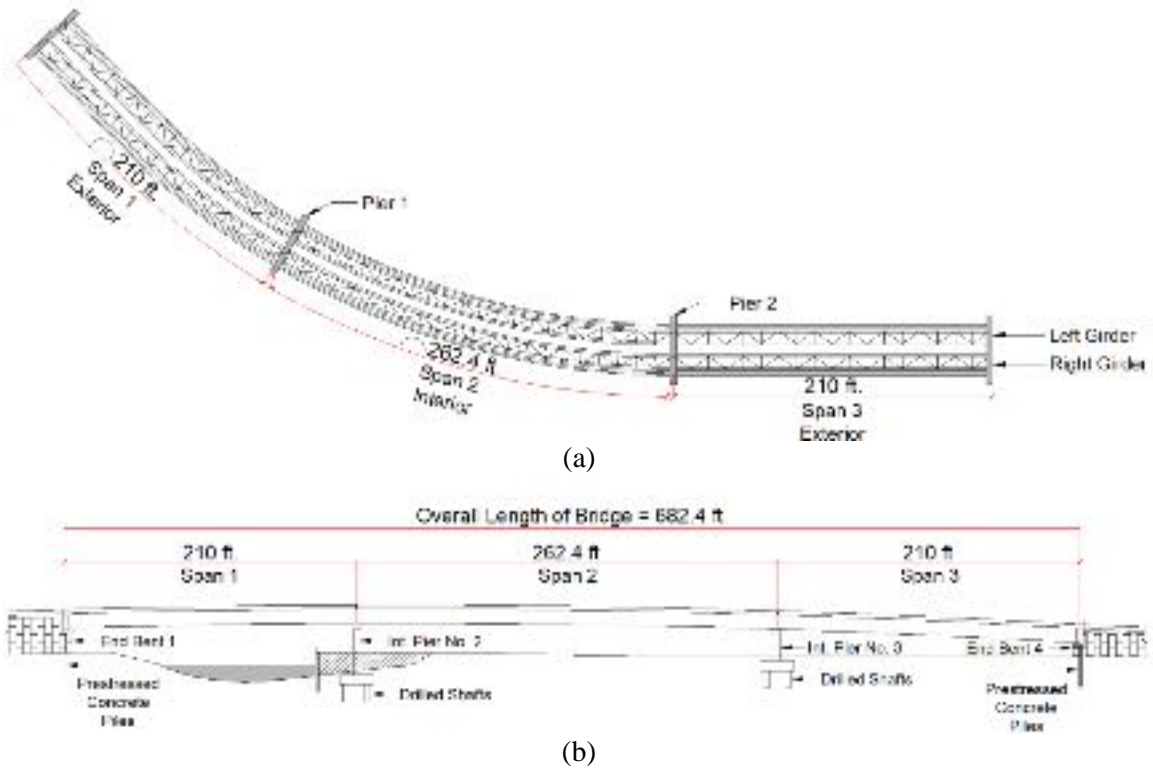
Continuous span bridge; (a) Plan view, (b) Elevation view.
